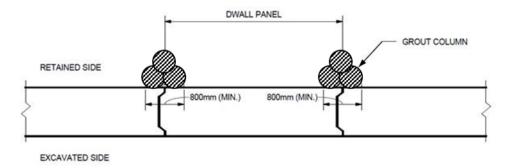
Minimum Width of Fissure Grouting
